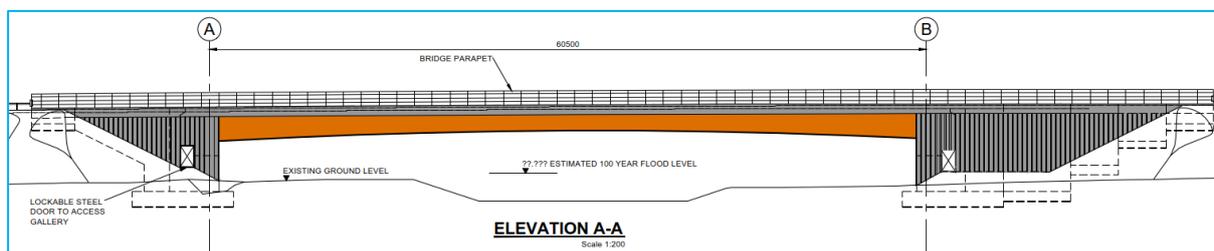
Structural Elevation of the Proposed Bridge Crossing
